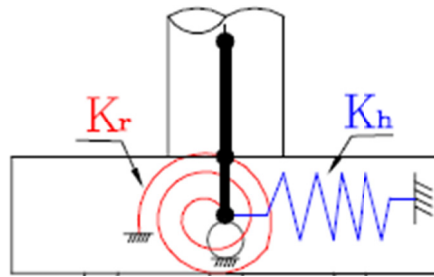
Foundation spring modeling detail [Choi 2002].
